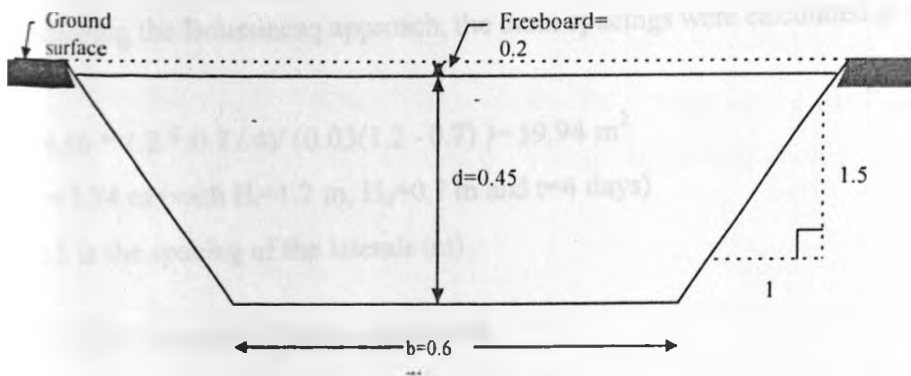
Cross-section of the main drain (dimensions in metres not to scale)
